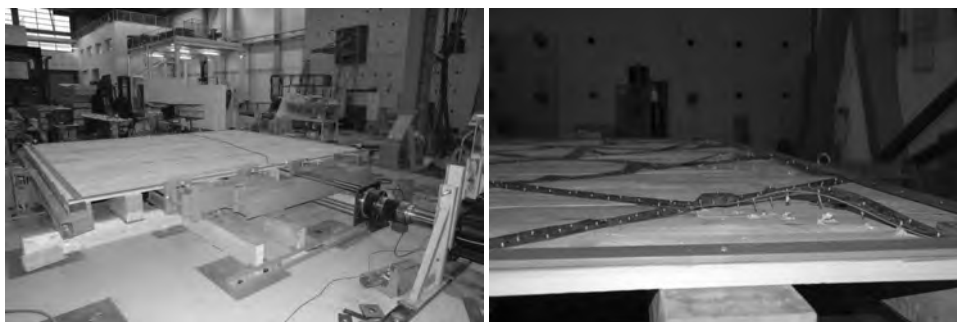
Setup for in-plane testing of full scale floor diaphragms (left) and view of a broken floor specimen after the tests (right) (Baldessari et al., 2009).
